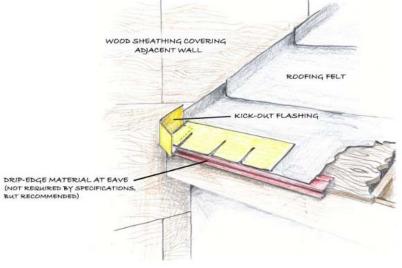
Step 1: Kick-out flashing beginning run of step flashing (Graphic courtesy of US EPA Indoor airPLUS)
